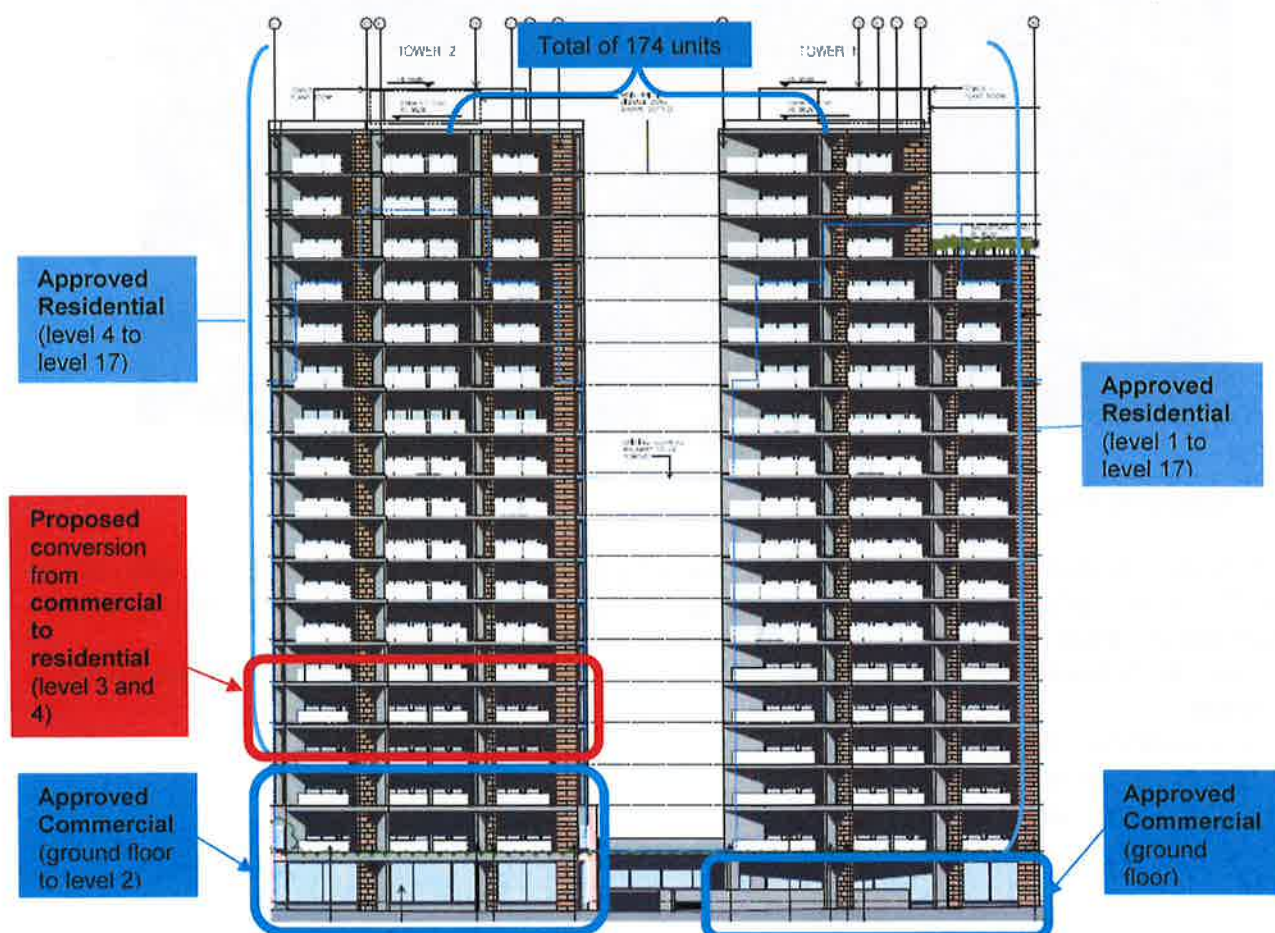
Image of towers at northern elevation (Source: Plans for MOD 3)
